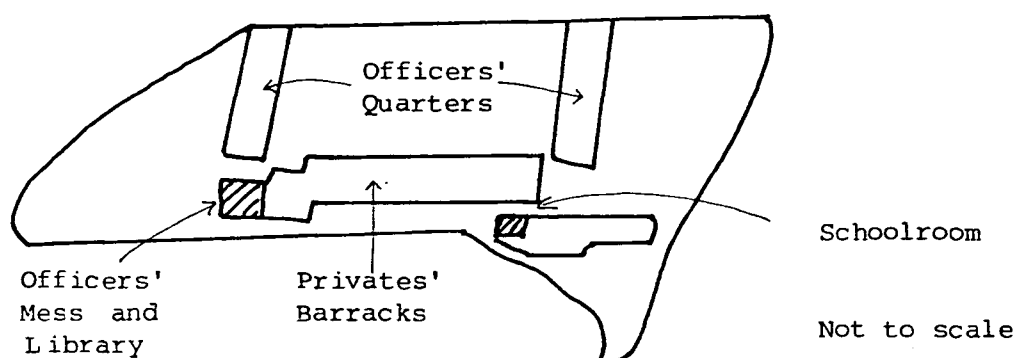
Royal Marine Barracks at Stonehouse, 1831. Sketchplan
